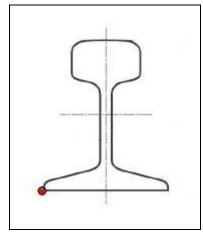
Rail Cross-Section – Point of Maximum Normal Stress
